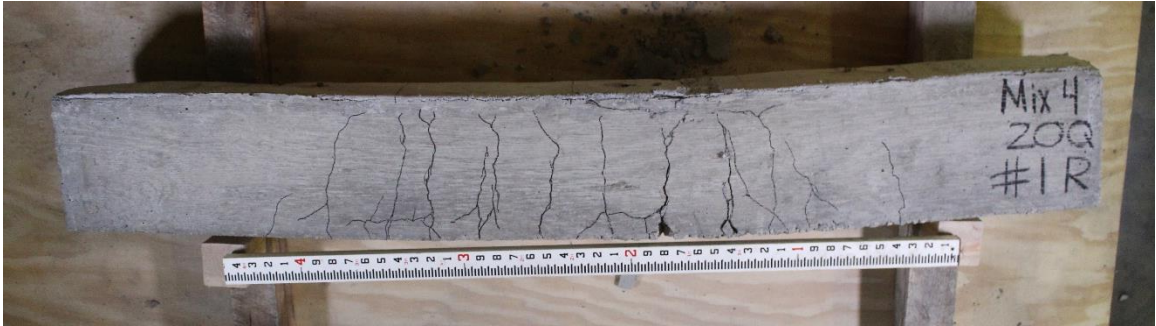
Mixture 4 (20Q) beam #1R: concrete beam side view.
